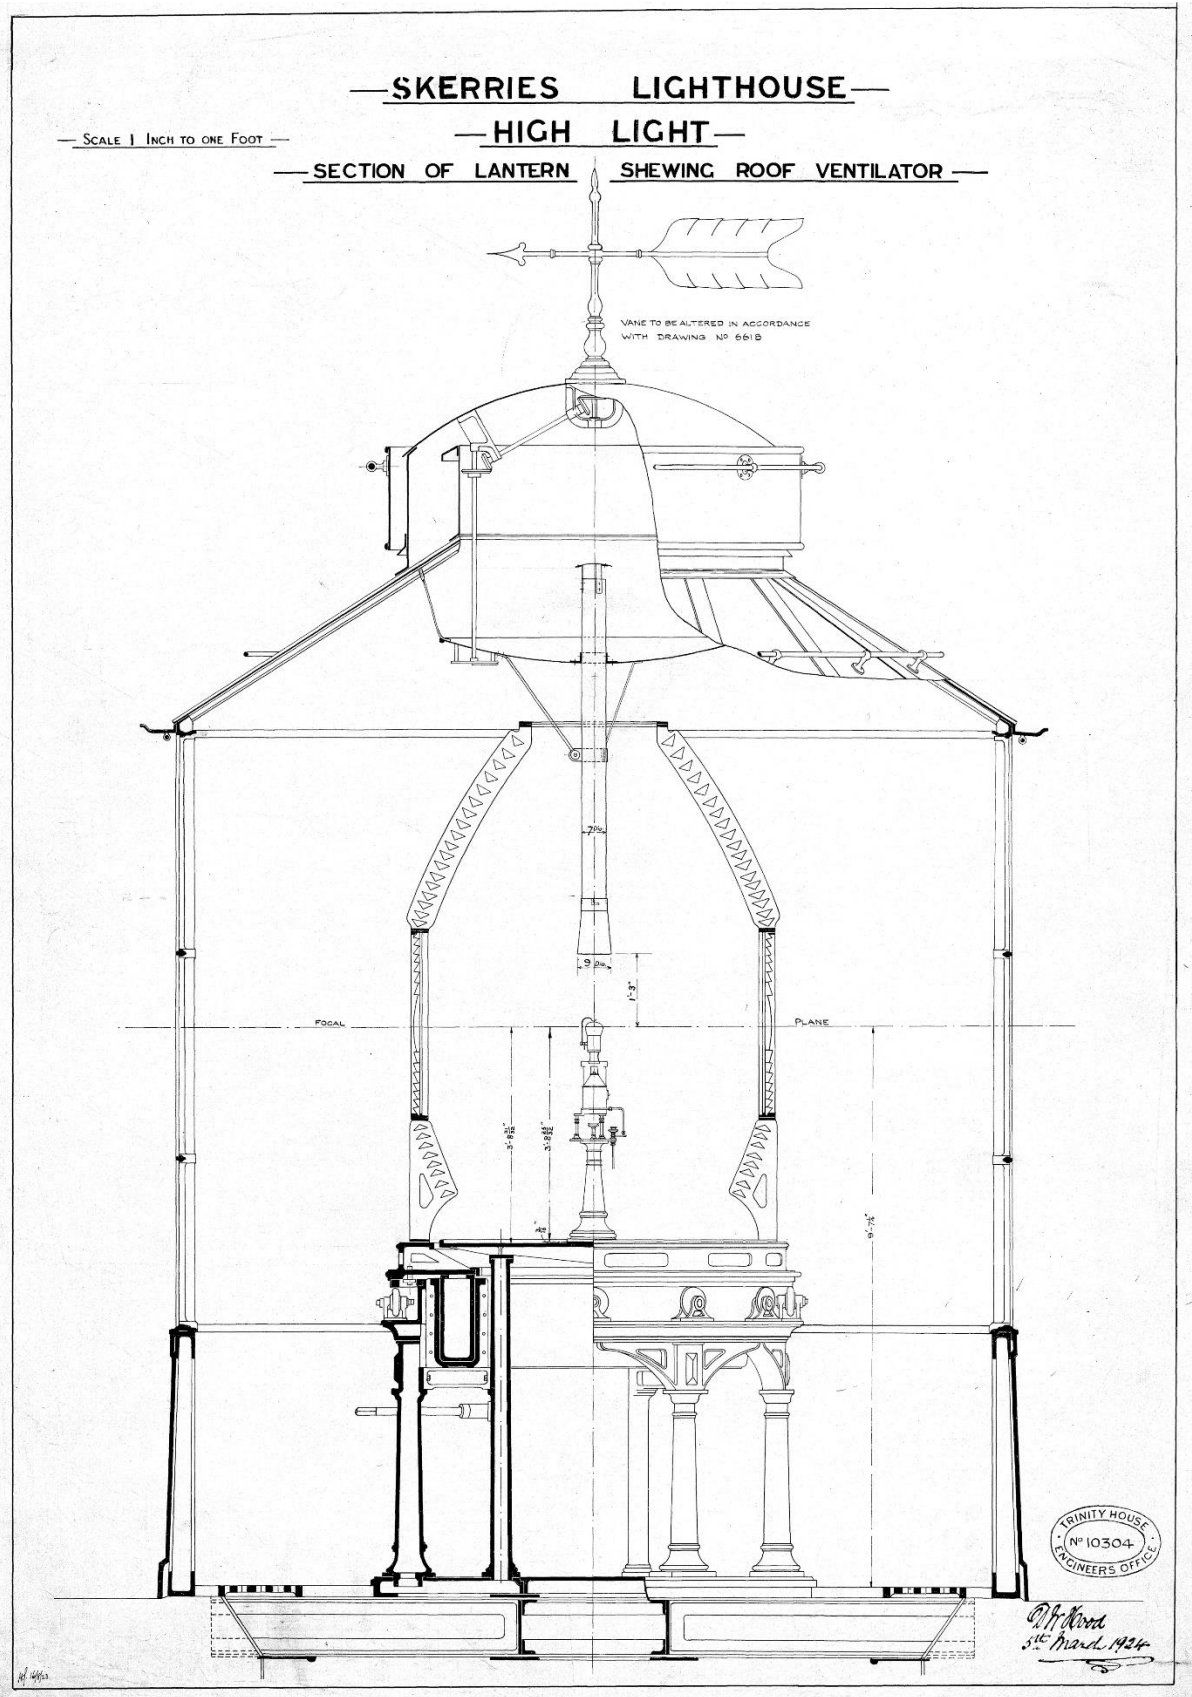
Drawing, dated to March 1924, for improvements to the lantern room ventilation and roof (image courtesy of Trinity House Archive. Drawing No. 10304).
